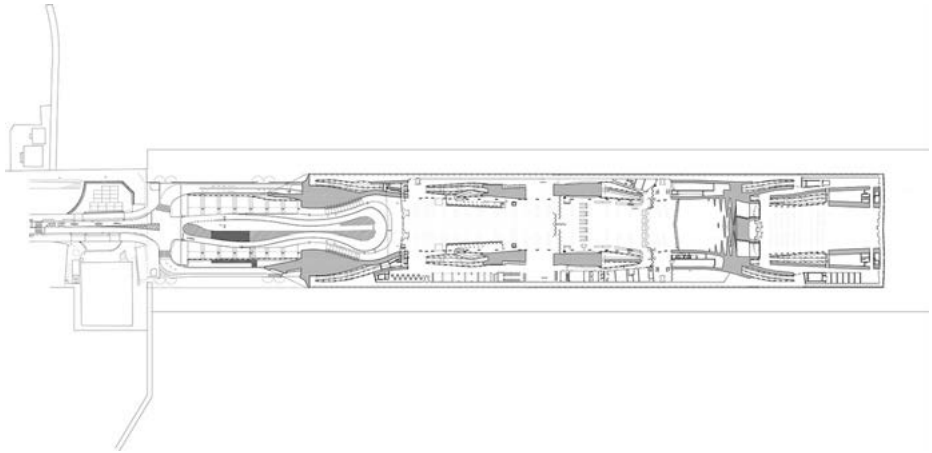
Floor Plan Yokohama Ferry Terminal (courtesy Foreign Office Architects)
